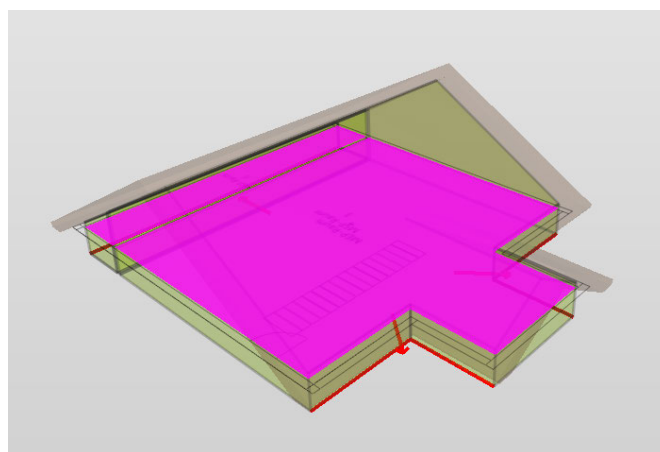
Error reporting that the rooms intersect the roof and do not touch a building element on their top surfaces
